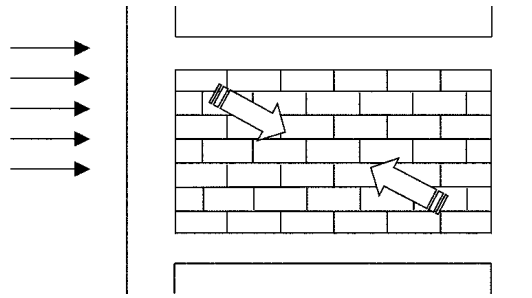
Compressive diagonal forces on brick wall due to lateral load
